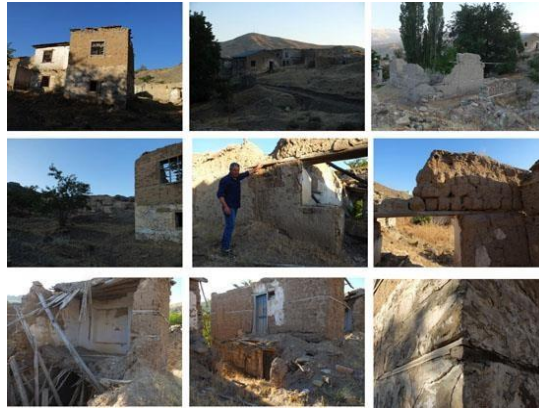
Houses and constructive details of Eski Porsuk village (© CRAterre_C. Sadozai)
